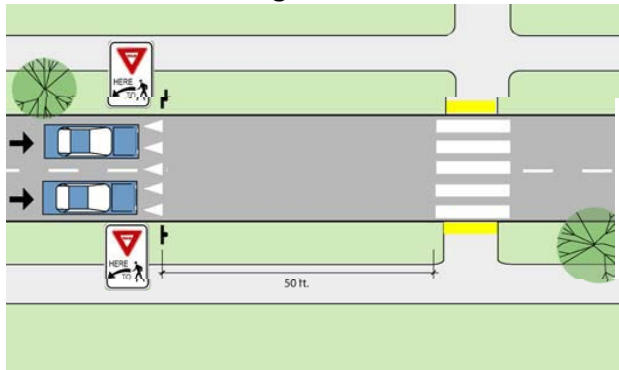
R. Crosswalk Sign and Yield Line Placement
